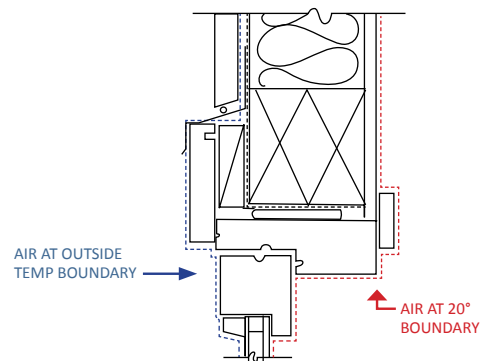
JMF Head installation detail in standard 90mm thick wall
